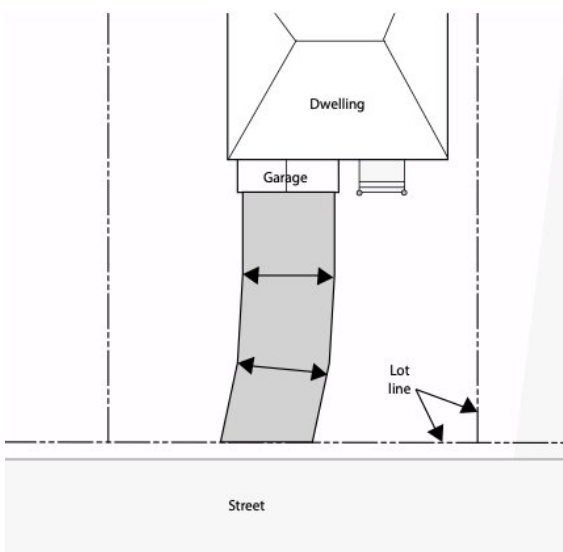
Plan view illustrating driveway width. (Source: Zoning By-law 2014-014)
